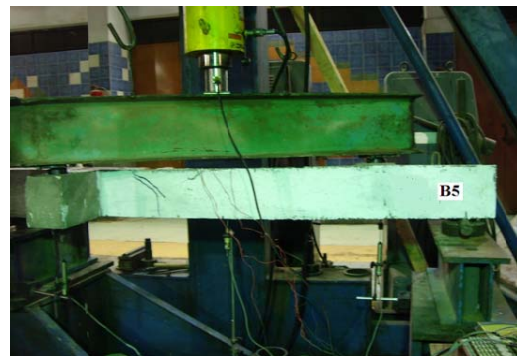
(f) Failure modes and crack patterns of the tested beam B5
